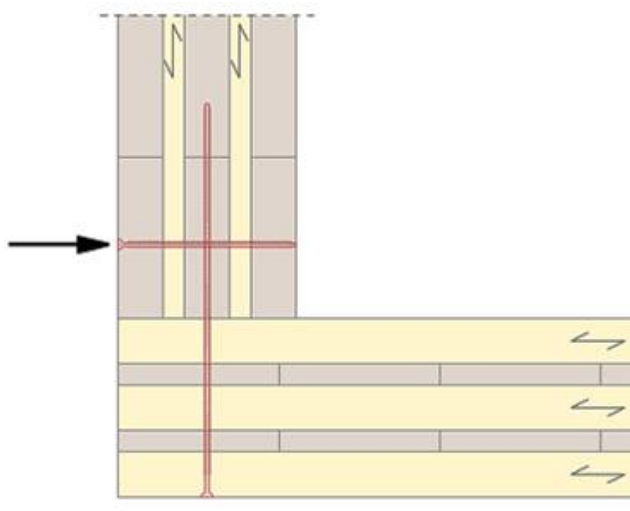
Reinforcement of cross-laminated timber (CLT) members with screws under transverse tensile stress perpendicular to the wide faces
